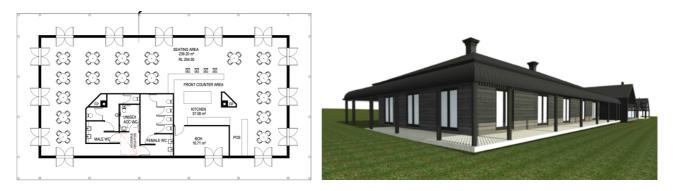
Extract from the architectural drawings showing floor plan and 3D render of Building 3
